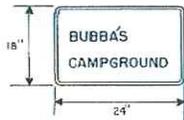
TYPICAL TRAILBLAZER SIGN DETAIL
